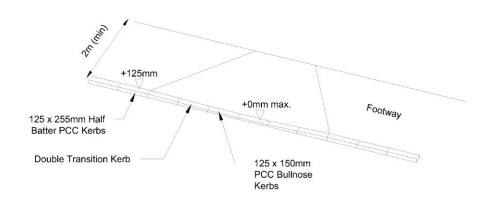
Dropped Kerb Detail at Designated Pedestrian Crossing
